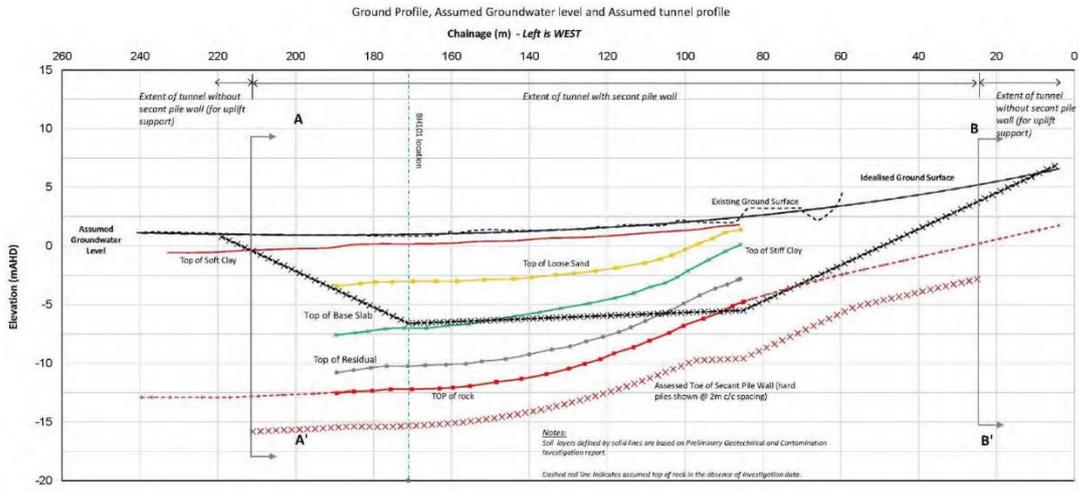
Long section showing the extent of secant piles required to provide uplift support
